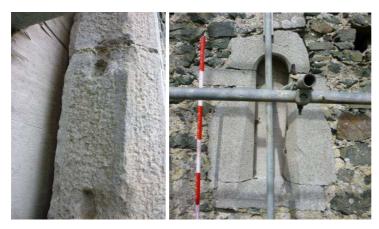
Original window detail. The original round headed loop window (at the southern elevation) has splayed jambs flared toward the base. Some of the new openings replicate this style. To the upper right of the loop is a possible putlog hole.
